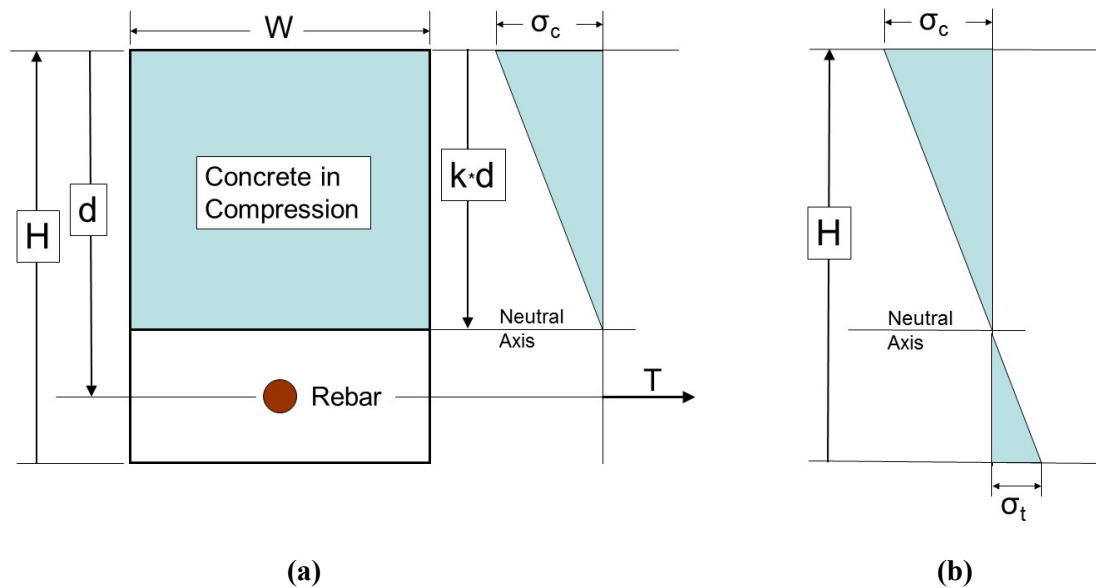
(a) Working Stresses in Rebar and Concrete, (b) Plain Concrete Stresses
